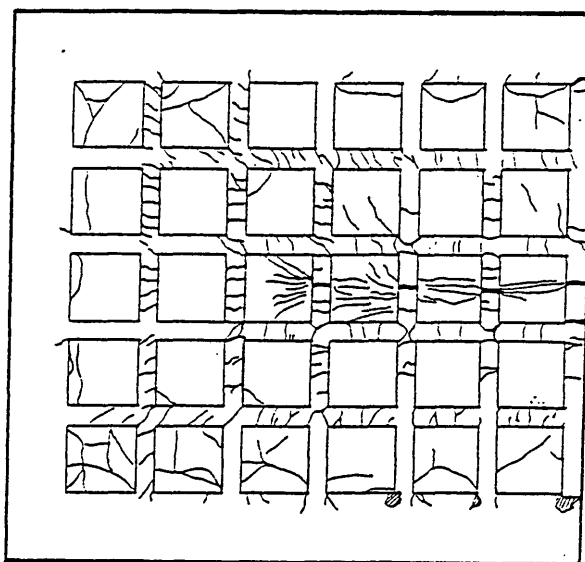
Failure Crack Pattern of R.C.Waffle Model Slab F3
